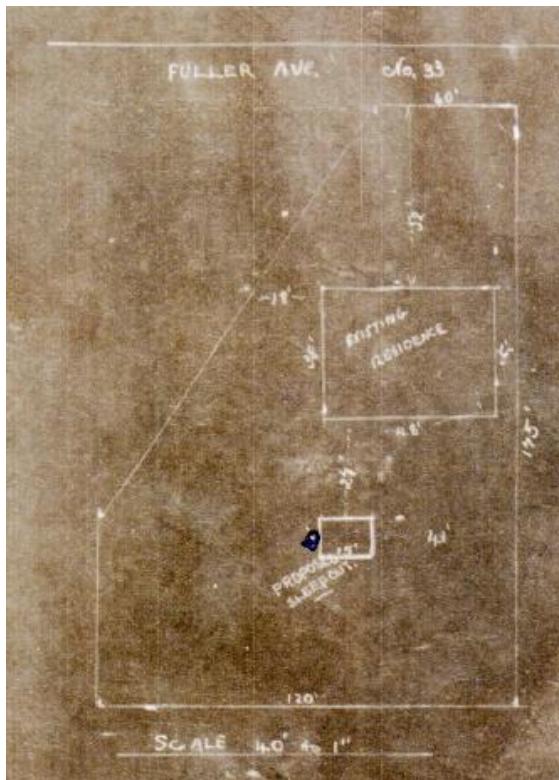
Undated plan showing the location of the sleepout constructed during Angwin's occupation (1941-1958) (City of Boroondara Building Plans 17752).
